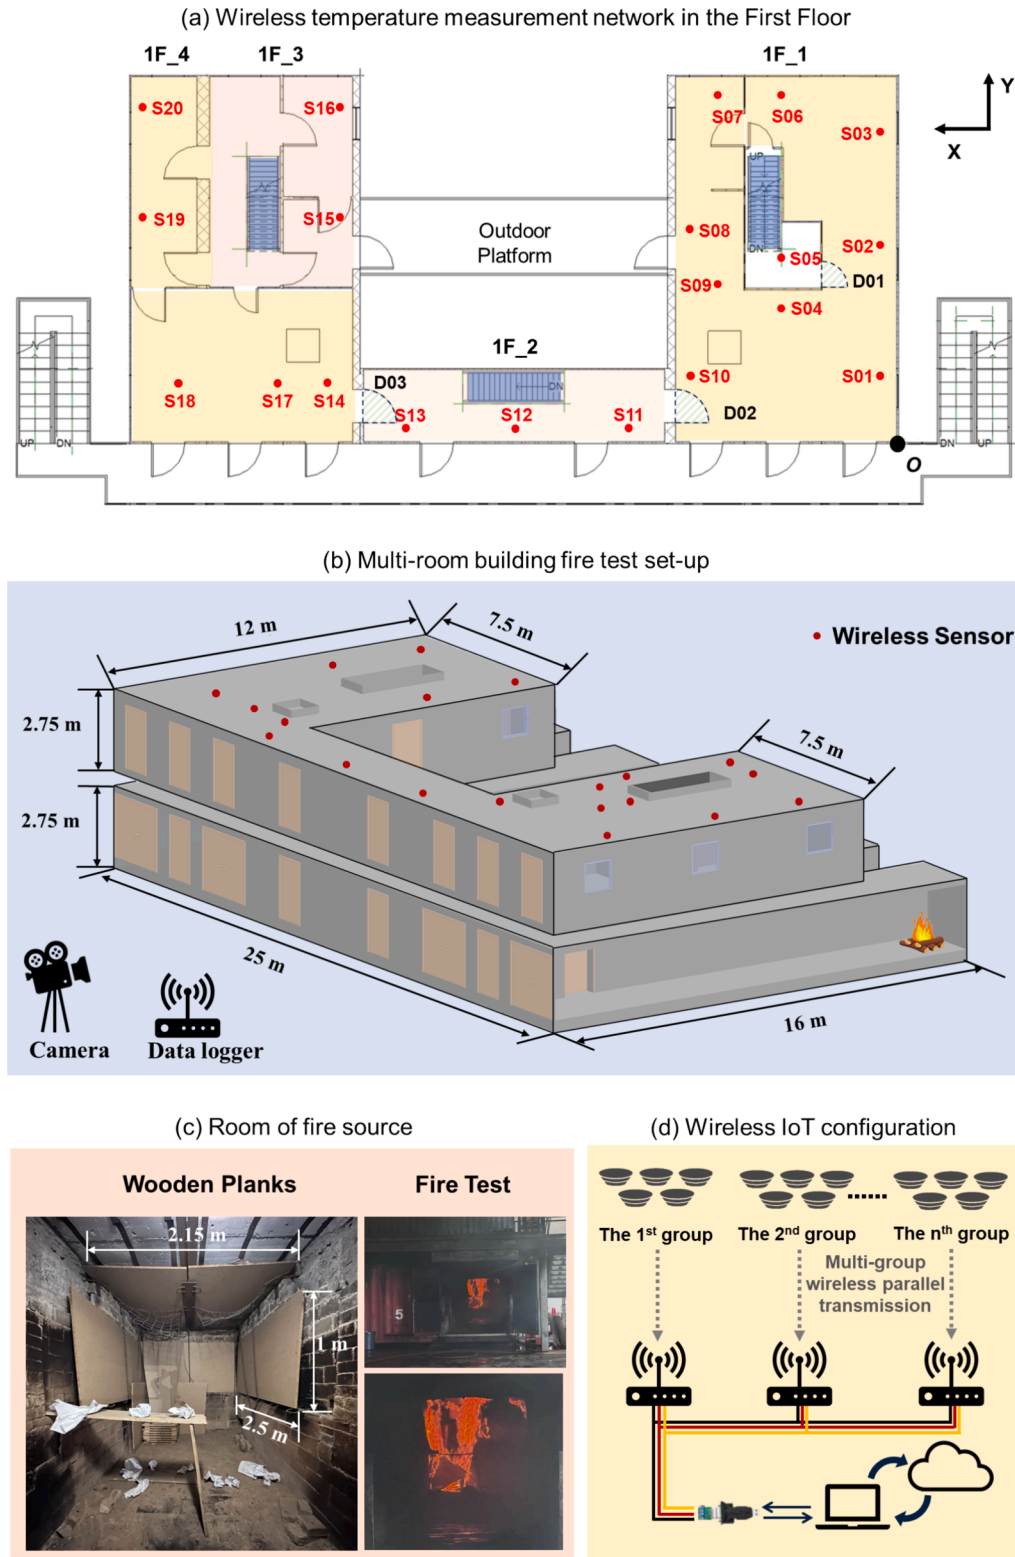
Schematic of wireless thermometry system in full-scale building fire test, (a) Wireless temperature measurement network in the 1st Floor, (b) Fire test set-up with Ground Floor and 1st floor, (c) detailed of the room of fire source on the Ground floor, and (d) wireless IoT configuration.
